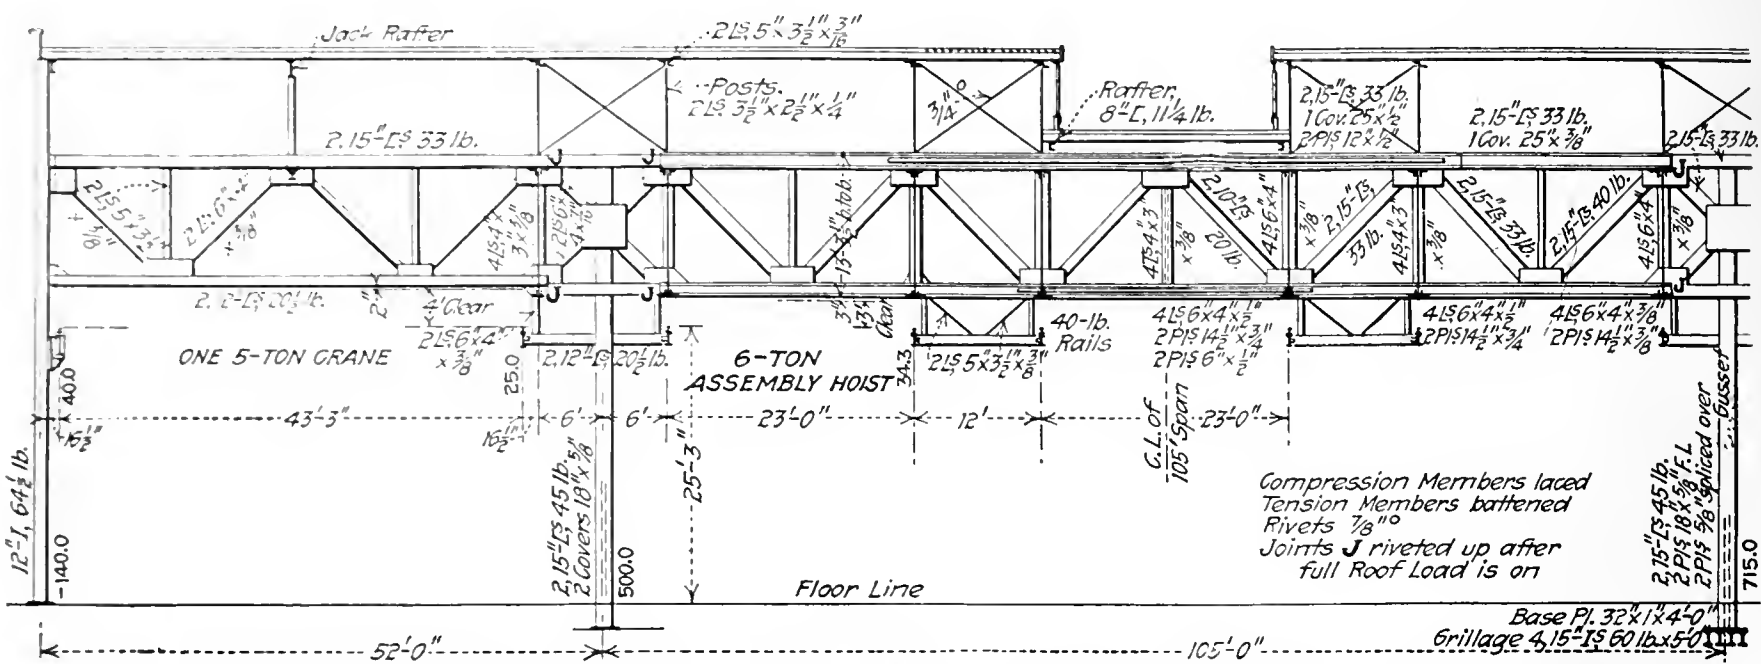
PLATE-AND-ANGLE AISLES KEPT CLEAR BY WIDE SPACING OF COLUMNS AND SUPPORT OF ROOF BY LONGITUDINAL TRUSSES
